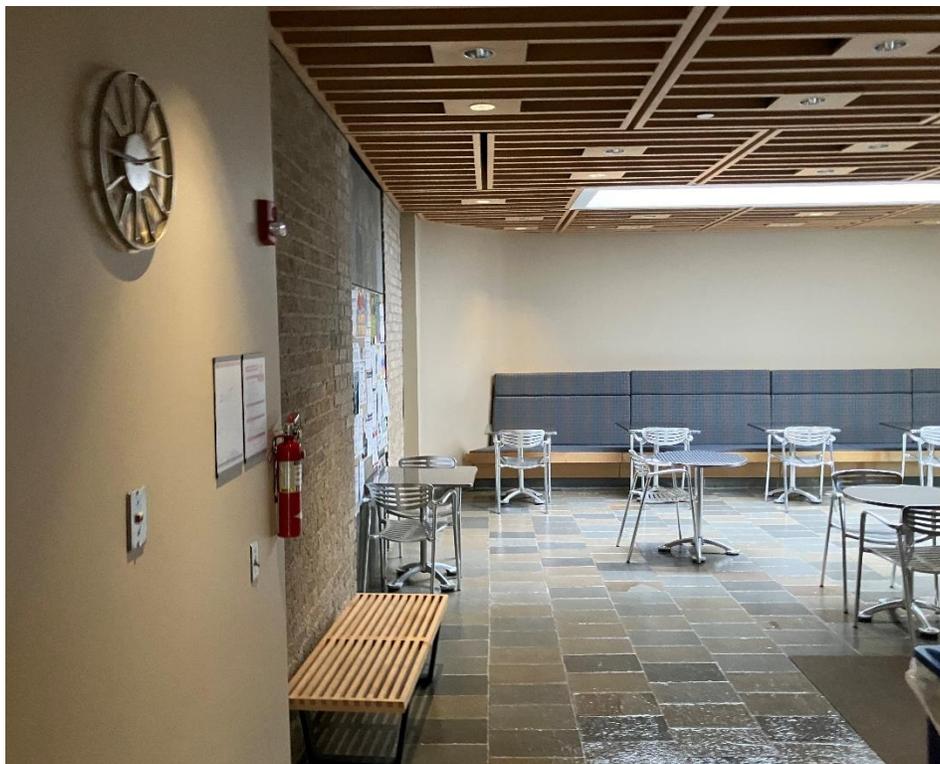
View of finishes in dining area 233. The slate tile flooring grout and set were sampled and determined to be non-ACM.
